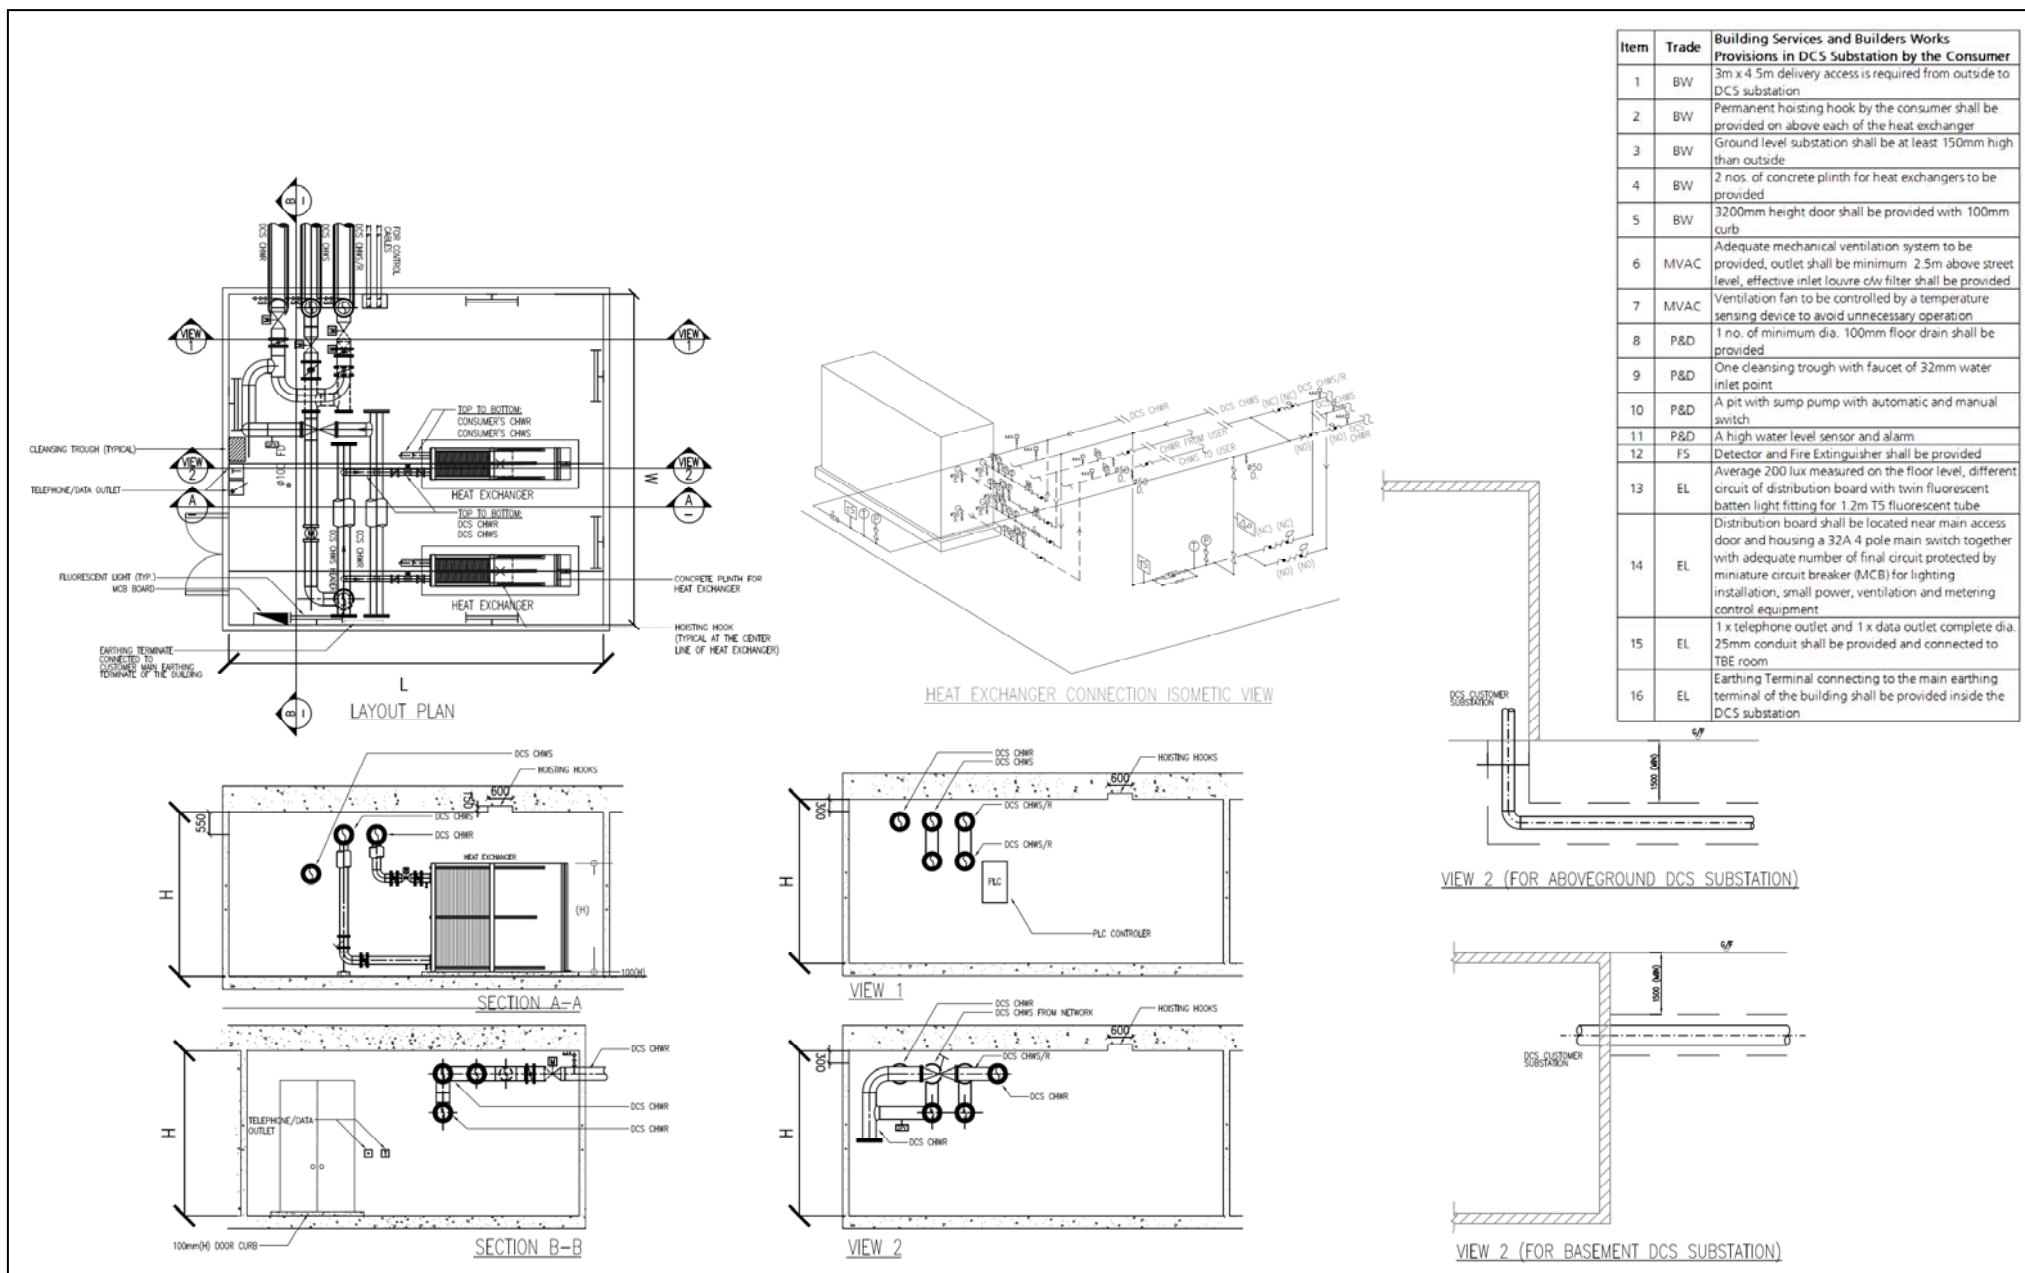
Typical Layout of Substation of Two Heat Exchangers
